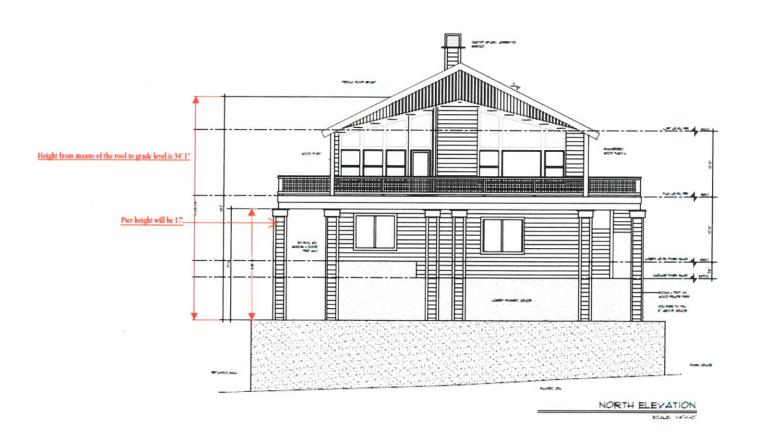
Revised North Elevation (reflects Planning and Zoning Commission recommendation)
